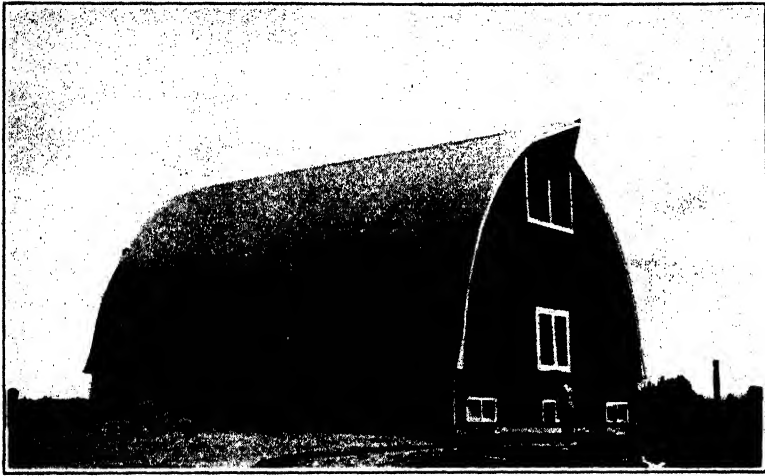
Laminated rafter construction similar to drawing shown used in this barn. Built in 1934. Rafters are of spruce full 1-inch thick, five laminations.
